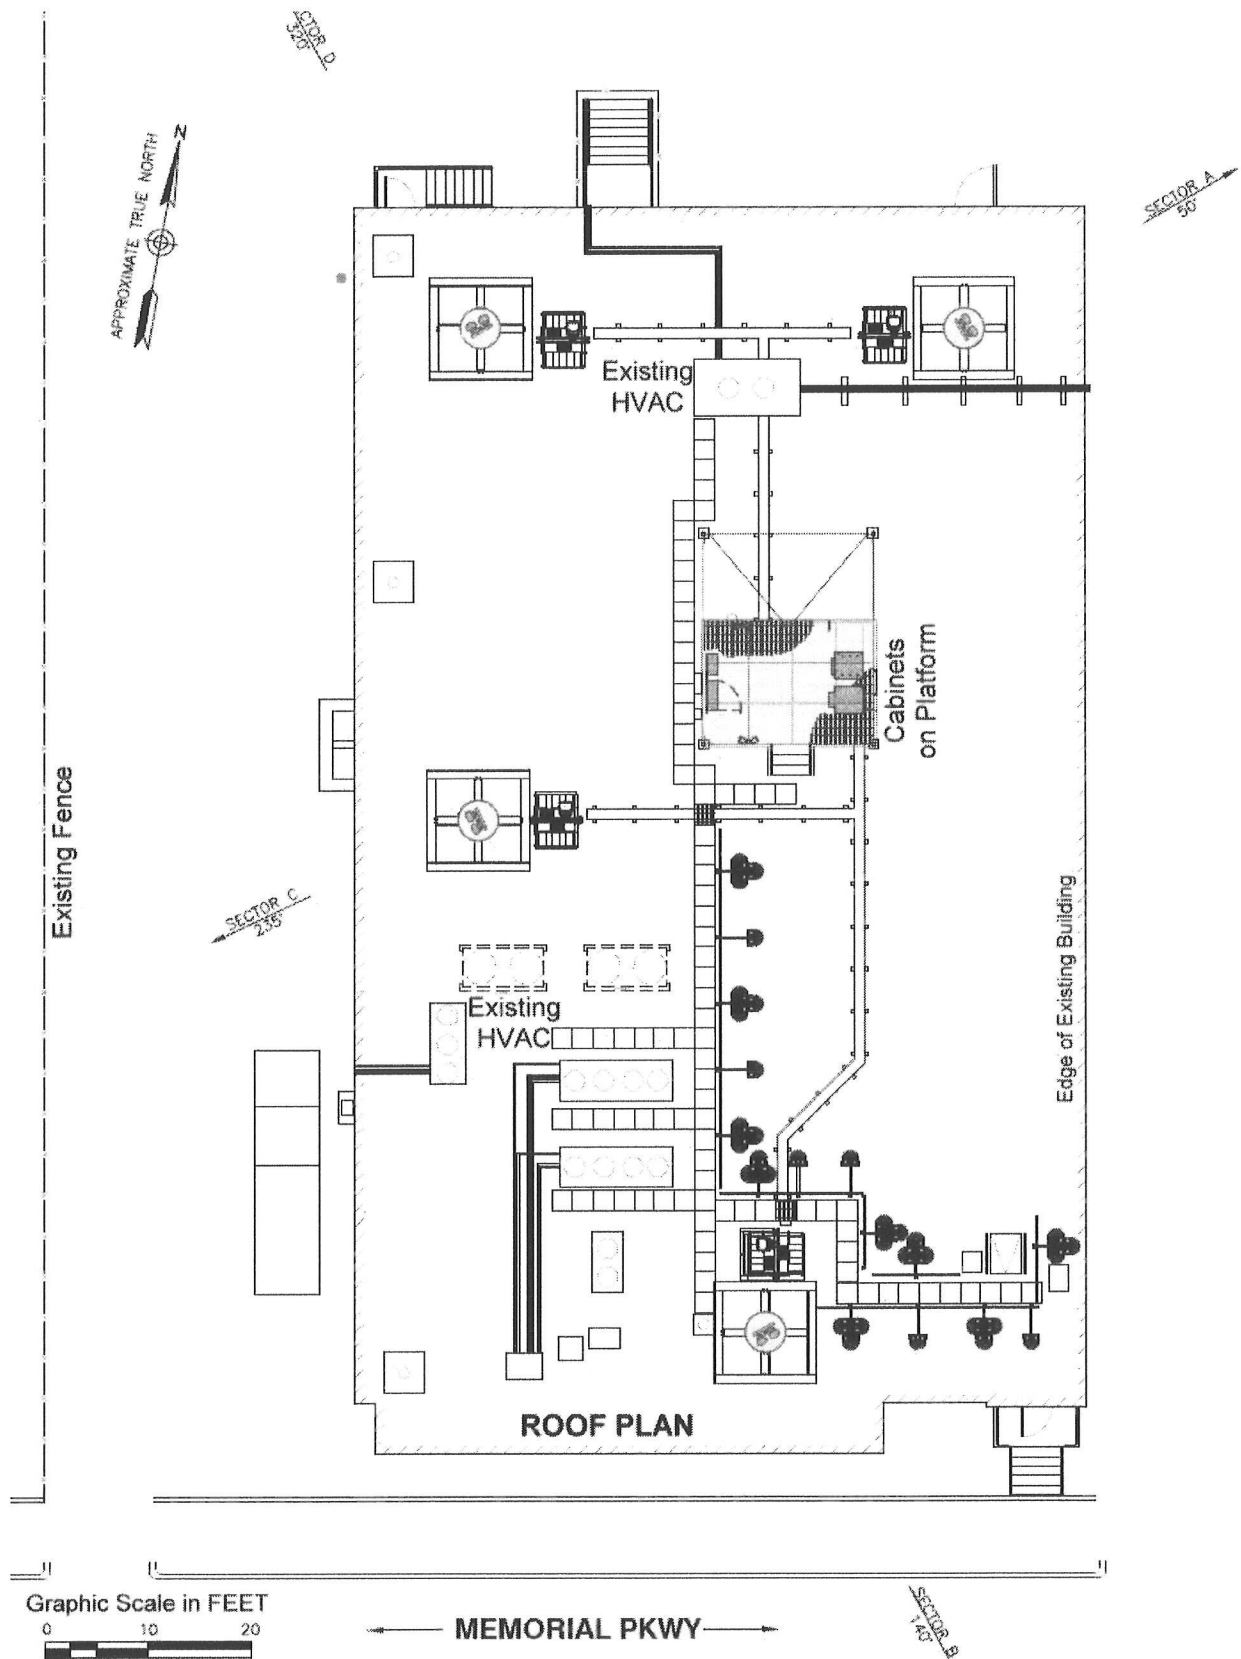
Roof Plan Showing the Existing and (Highlighted) Proposed Equipment
